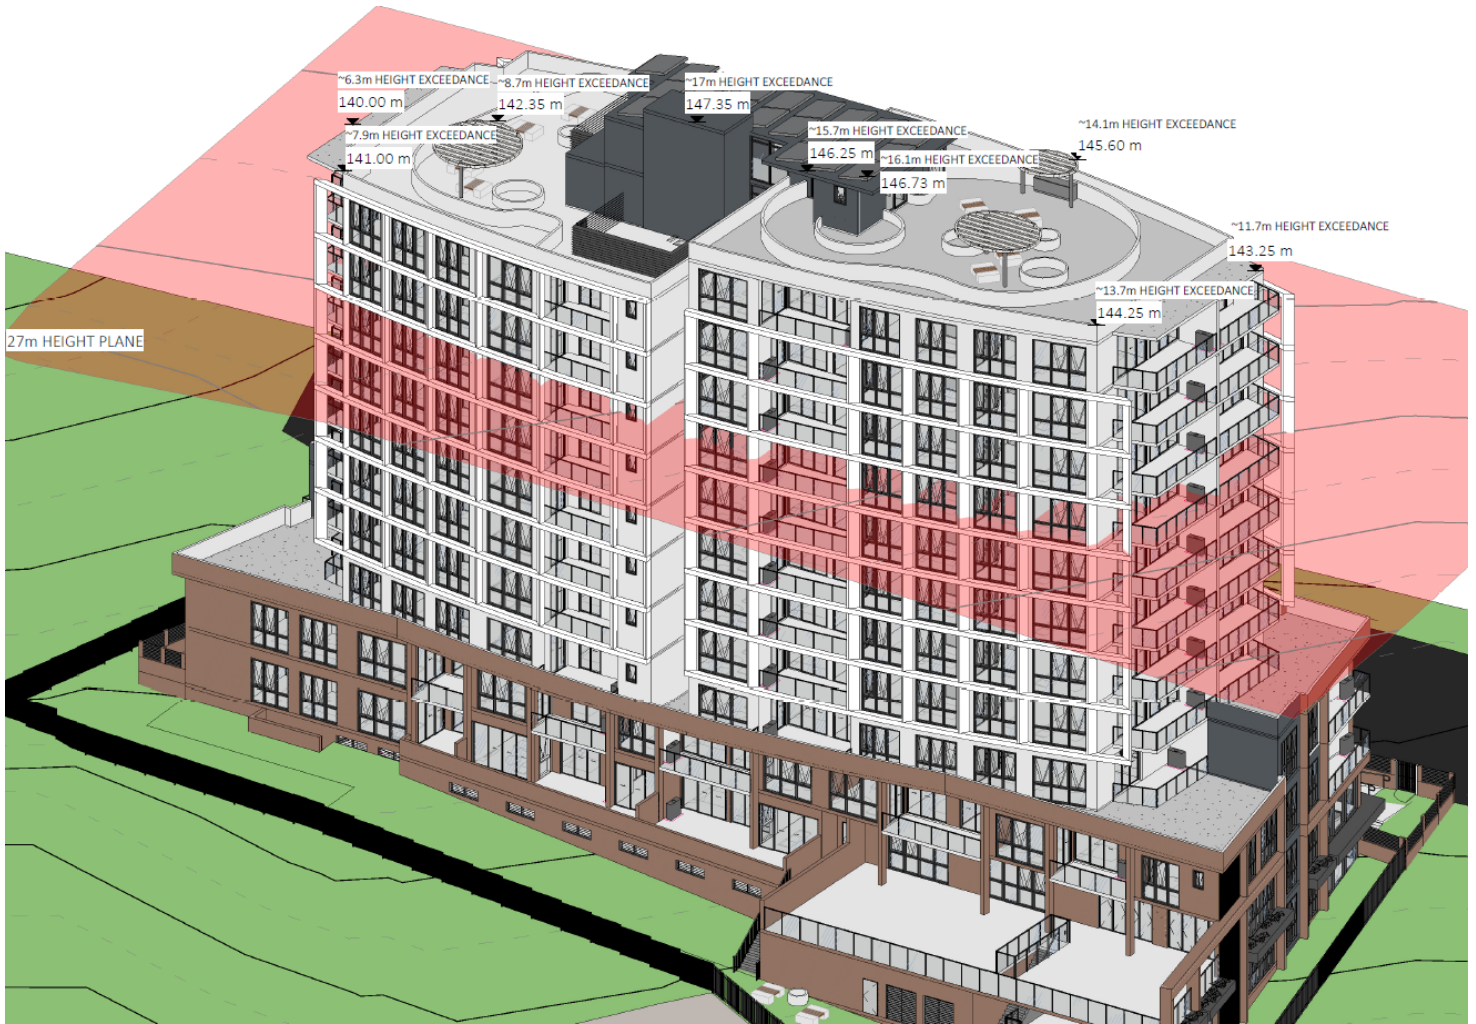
Excerpt, DA-0-900, Height Plane Building Diagram
